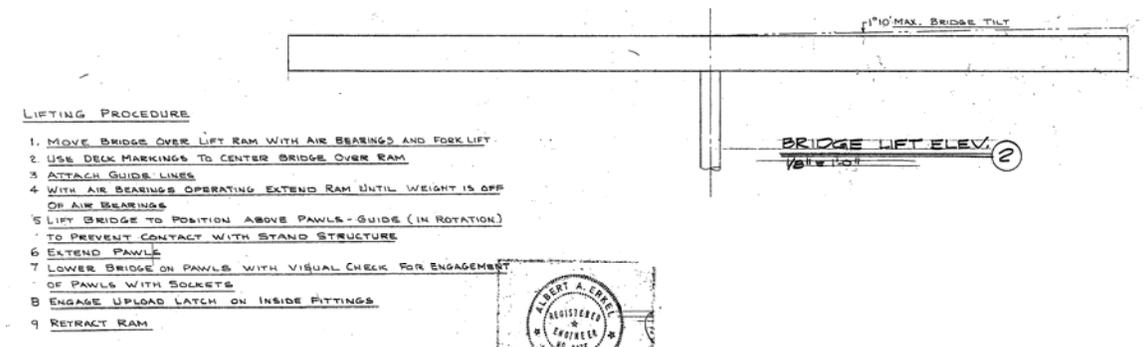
Elevation from original structural drawing, illustrating bridge lift procedure.
